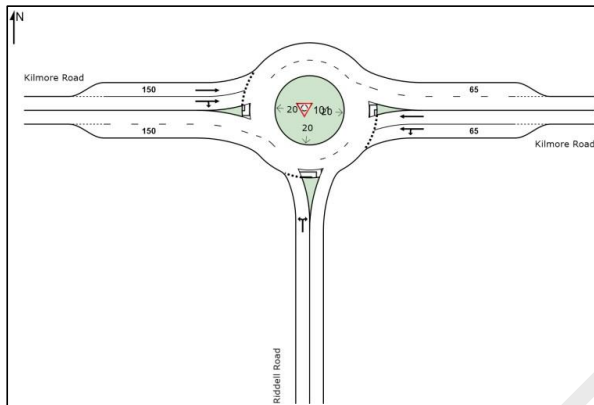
Model of the proposed roundabout at the intersection of Riddell Road & Kilmore Road
